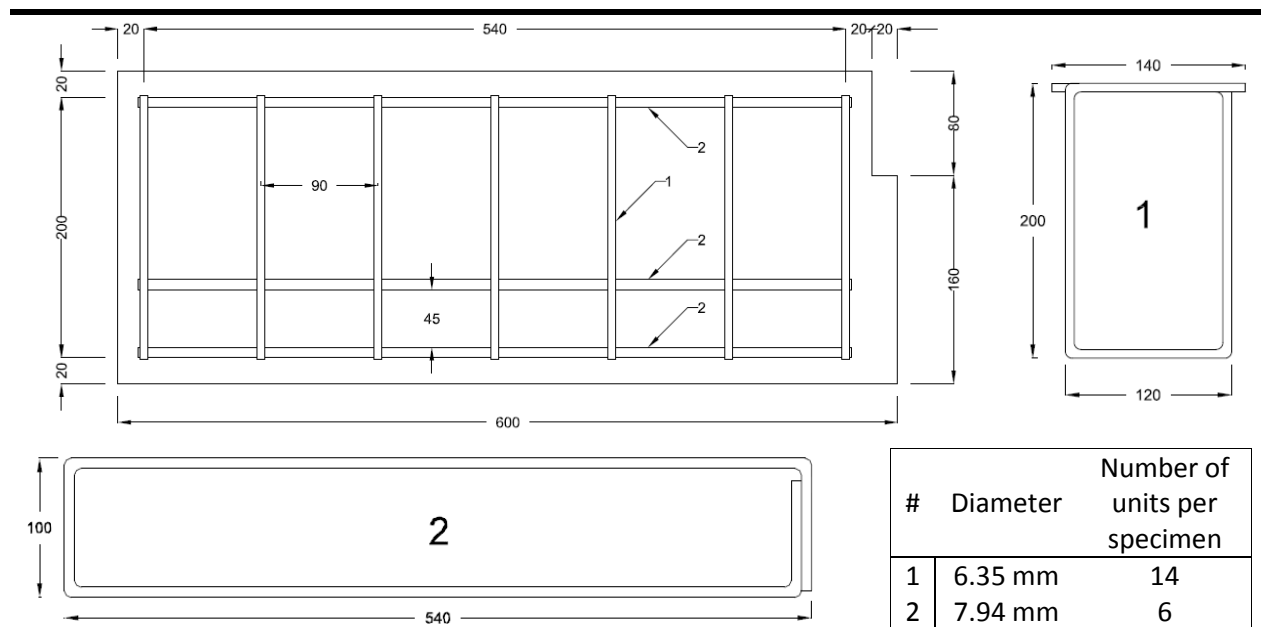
Auxiliary reinforcement for Type B specimen.
